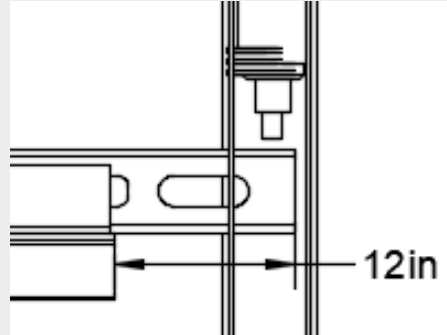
Longitudinal View VR30 Part, anchor and force block
